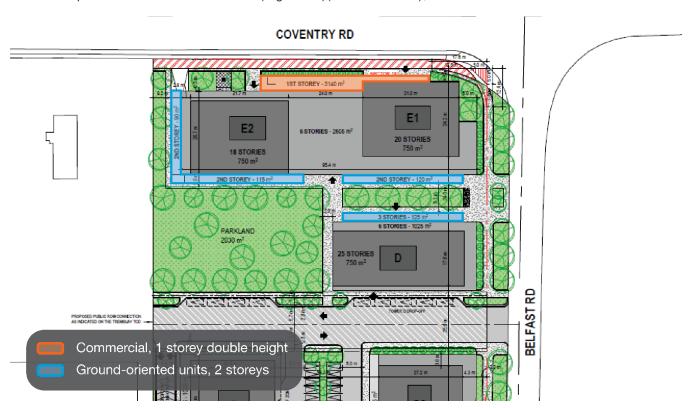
Diagram noting the locations of the commercial units and ground-oriented units in north block
